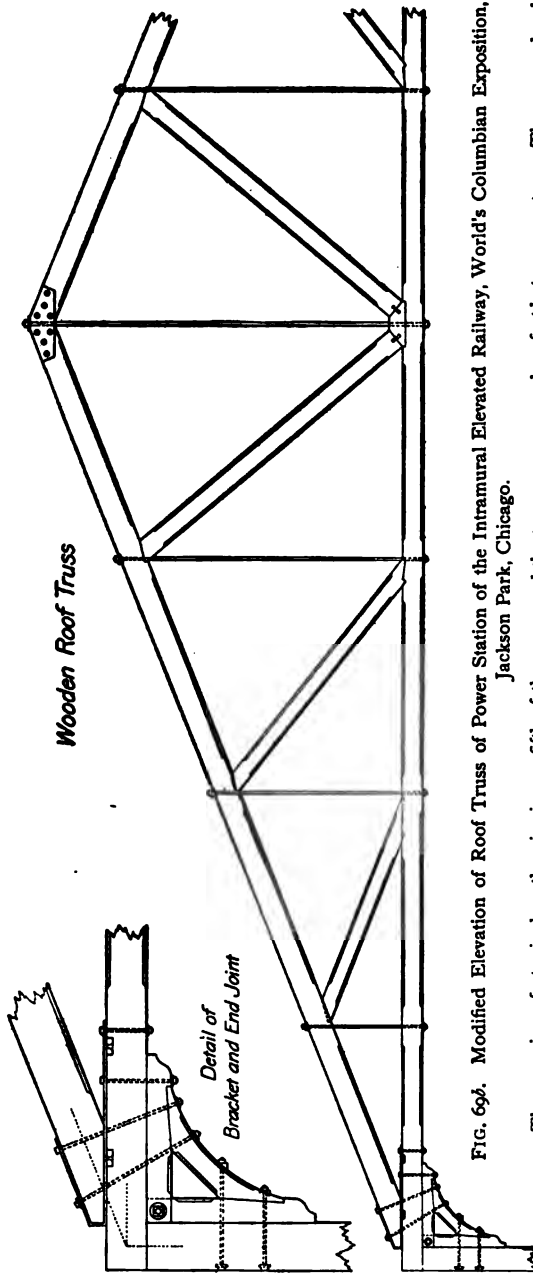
Modified Elevation of Roof Truss of Power Station of the Intramural Elevated Railway, World's Columbian Exposition, Jackson Park, Chicago.
